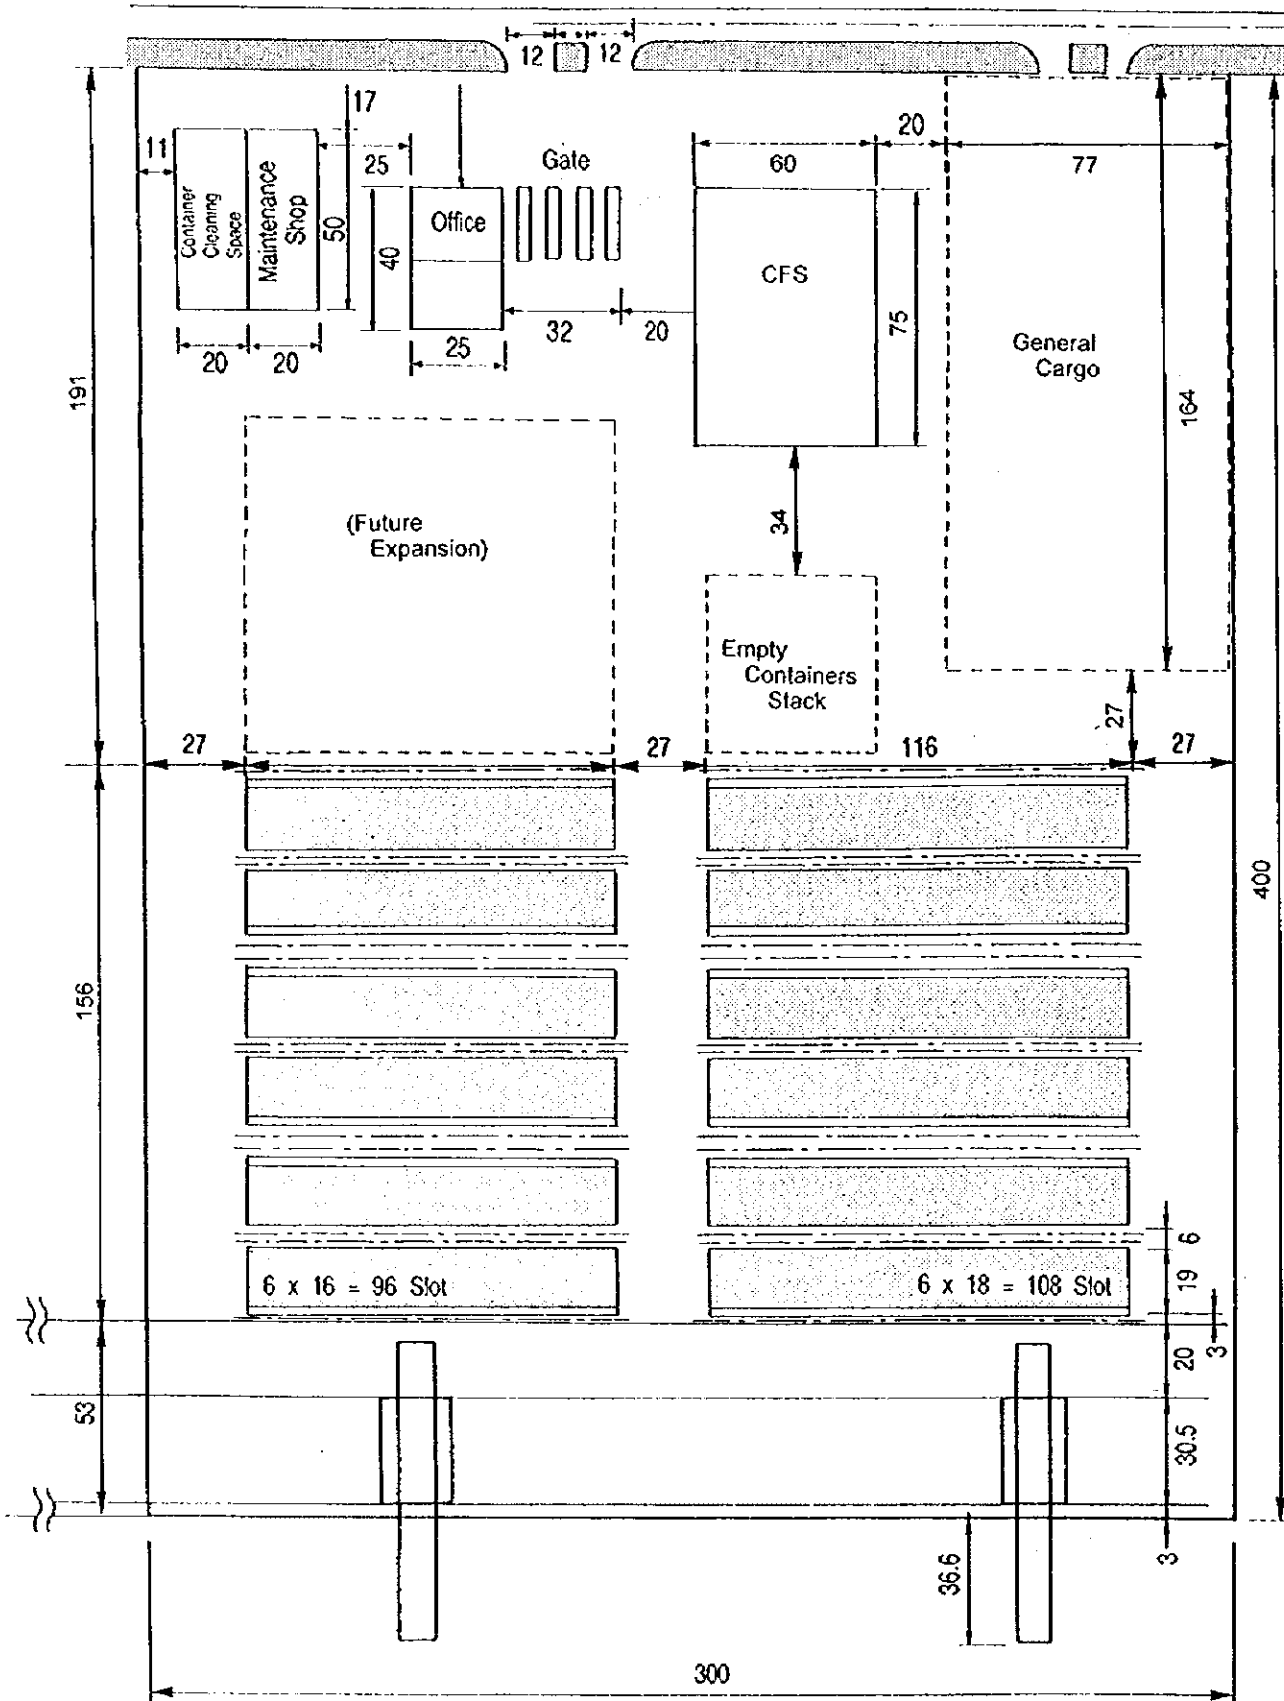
Layout Plan of the Container Terminal (Case 1)
